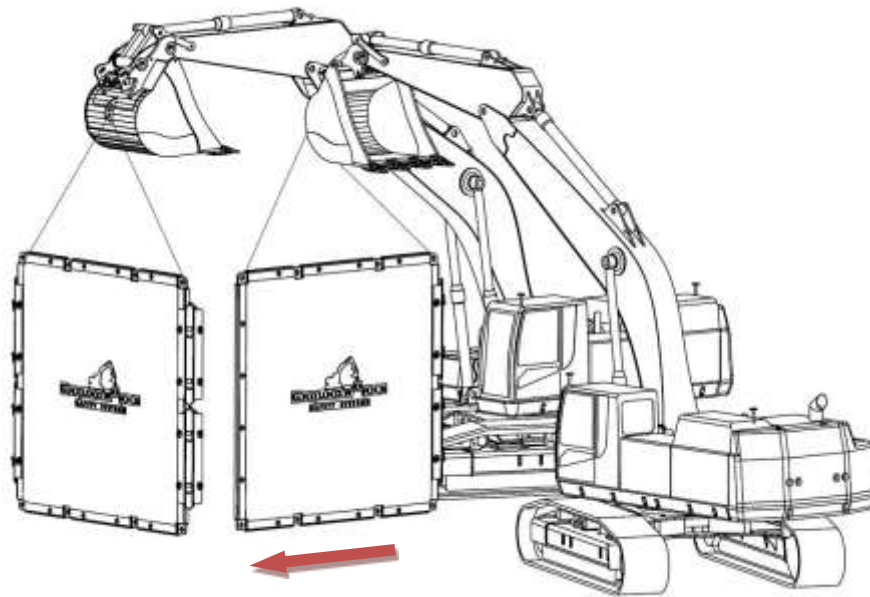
Pit Kit Step Three – Assembling Panel One with Panel Two
